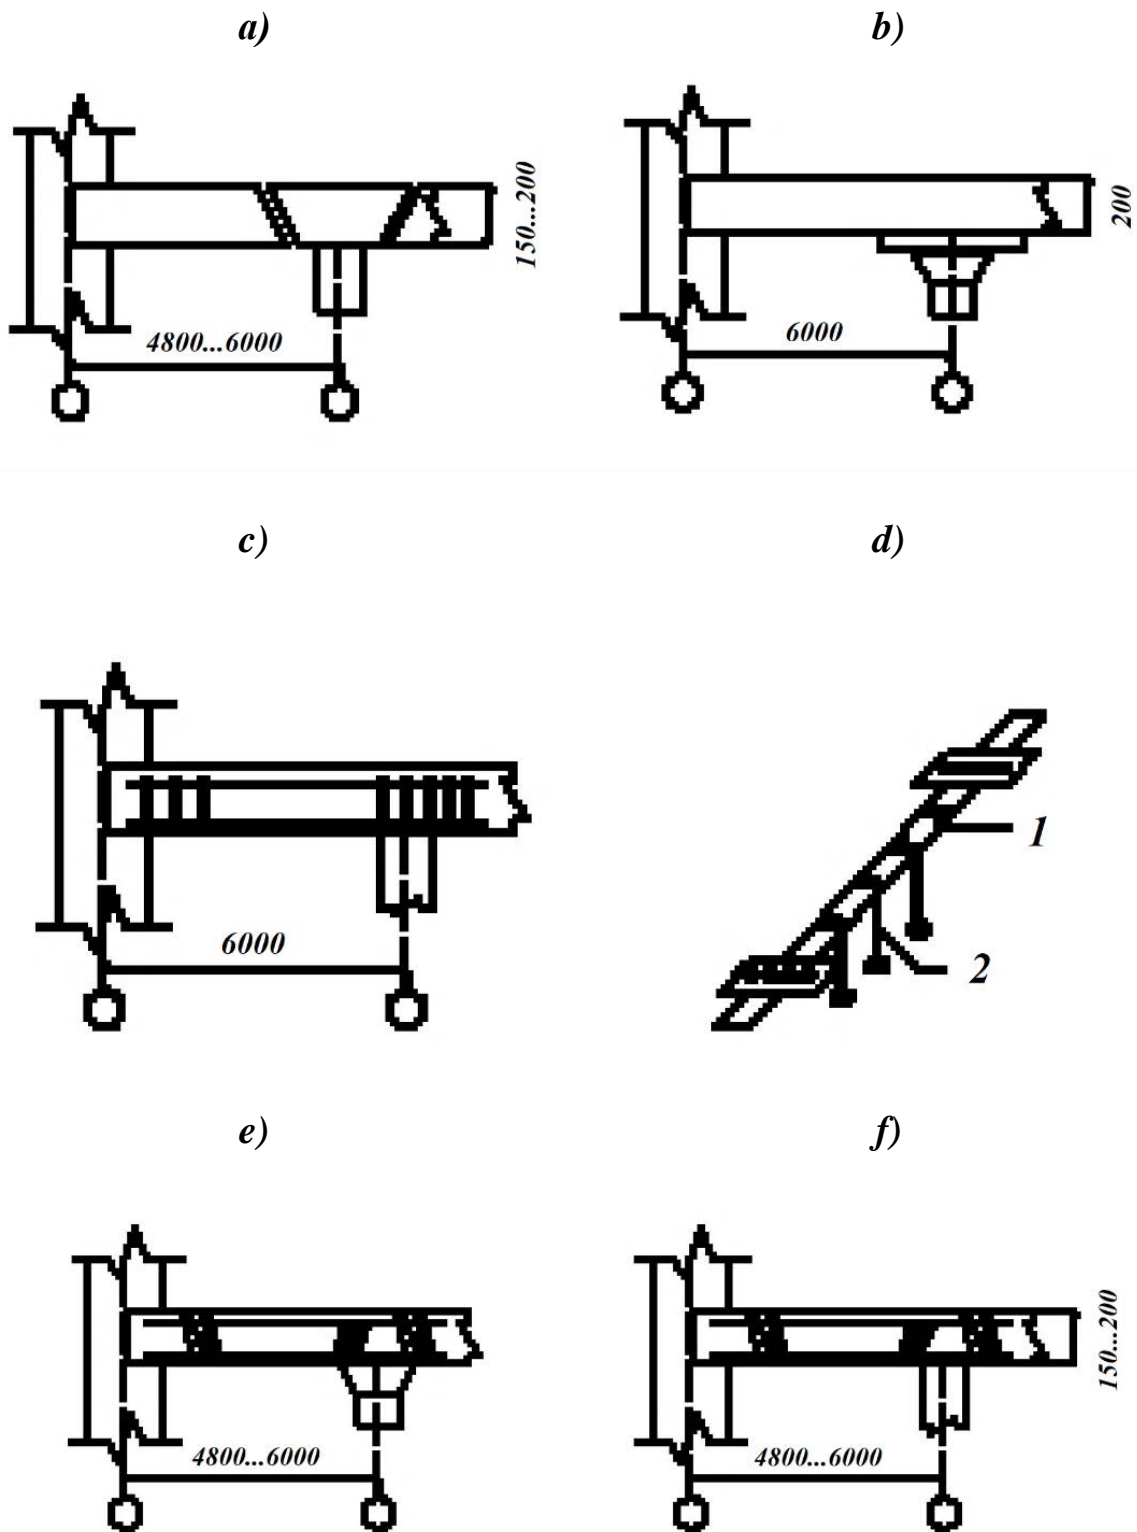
Junction details of monolithic floor slabs with vertical supports:
